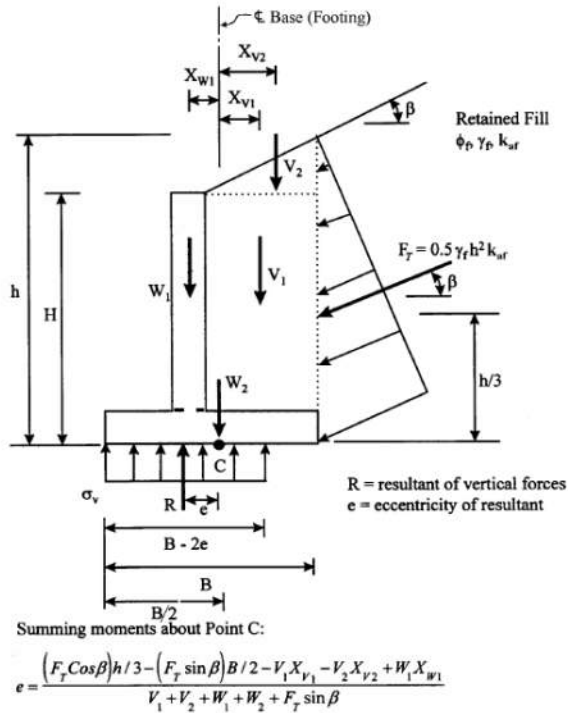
Bearing Stress Criteria for Conventional Wall Foundations on Soil
